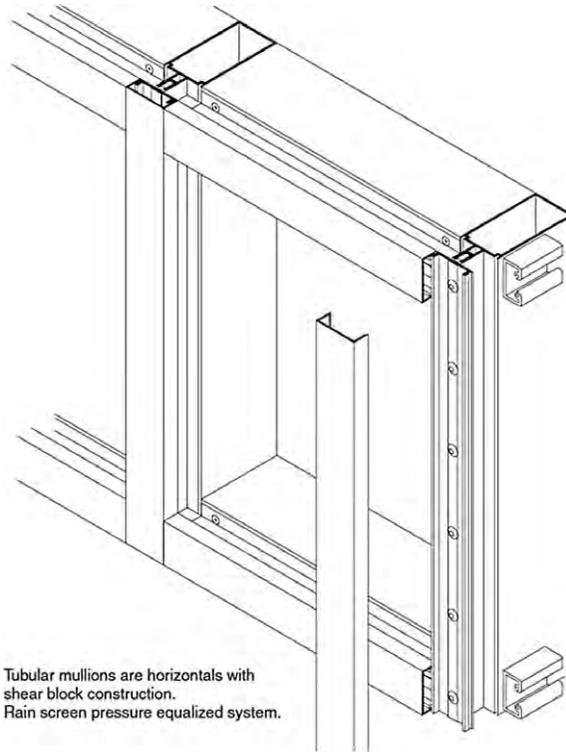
Detail of YCU 750 TU unitized curtain wall system
